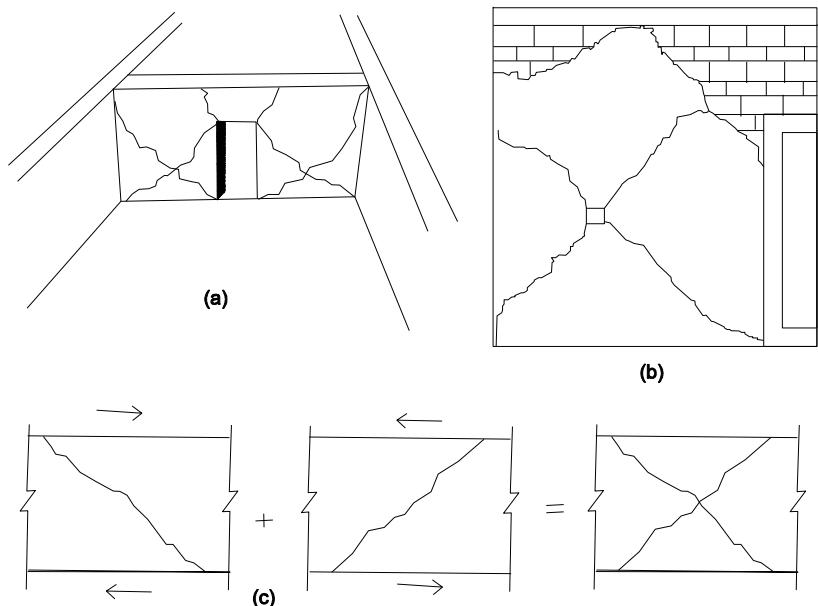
Illustrations show (a) drawing of X-shaped shear cracks in an interior wall; (b) typical X pattern (Leonis Adobe, Calabasas, Calif.); and (c) how X-shaped cracks result from a combination of shear cracks caused by alternate ground motions in opposite directions. (source: Manual of The Getty Conservation Institute)
